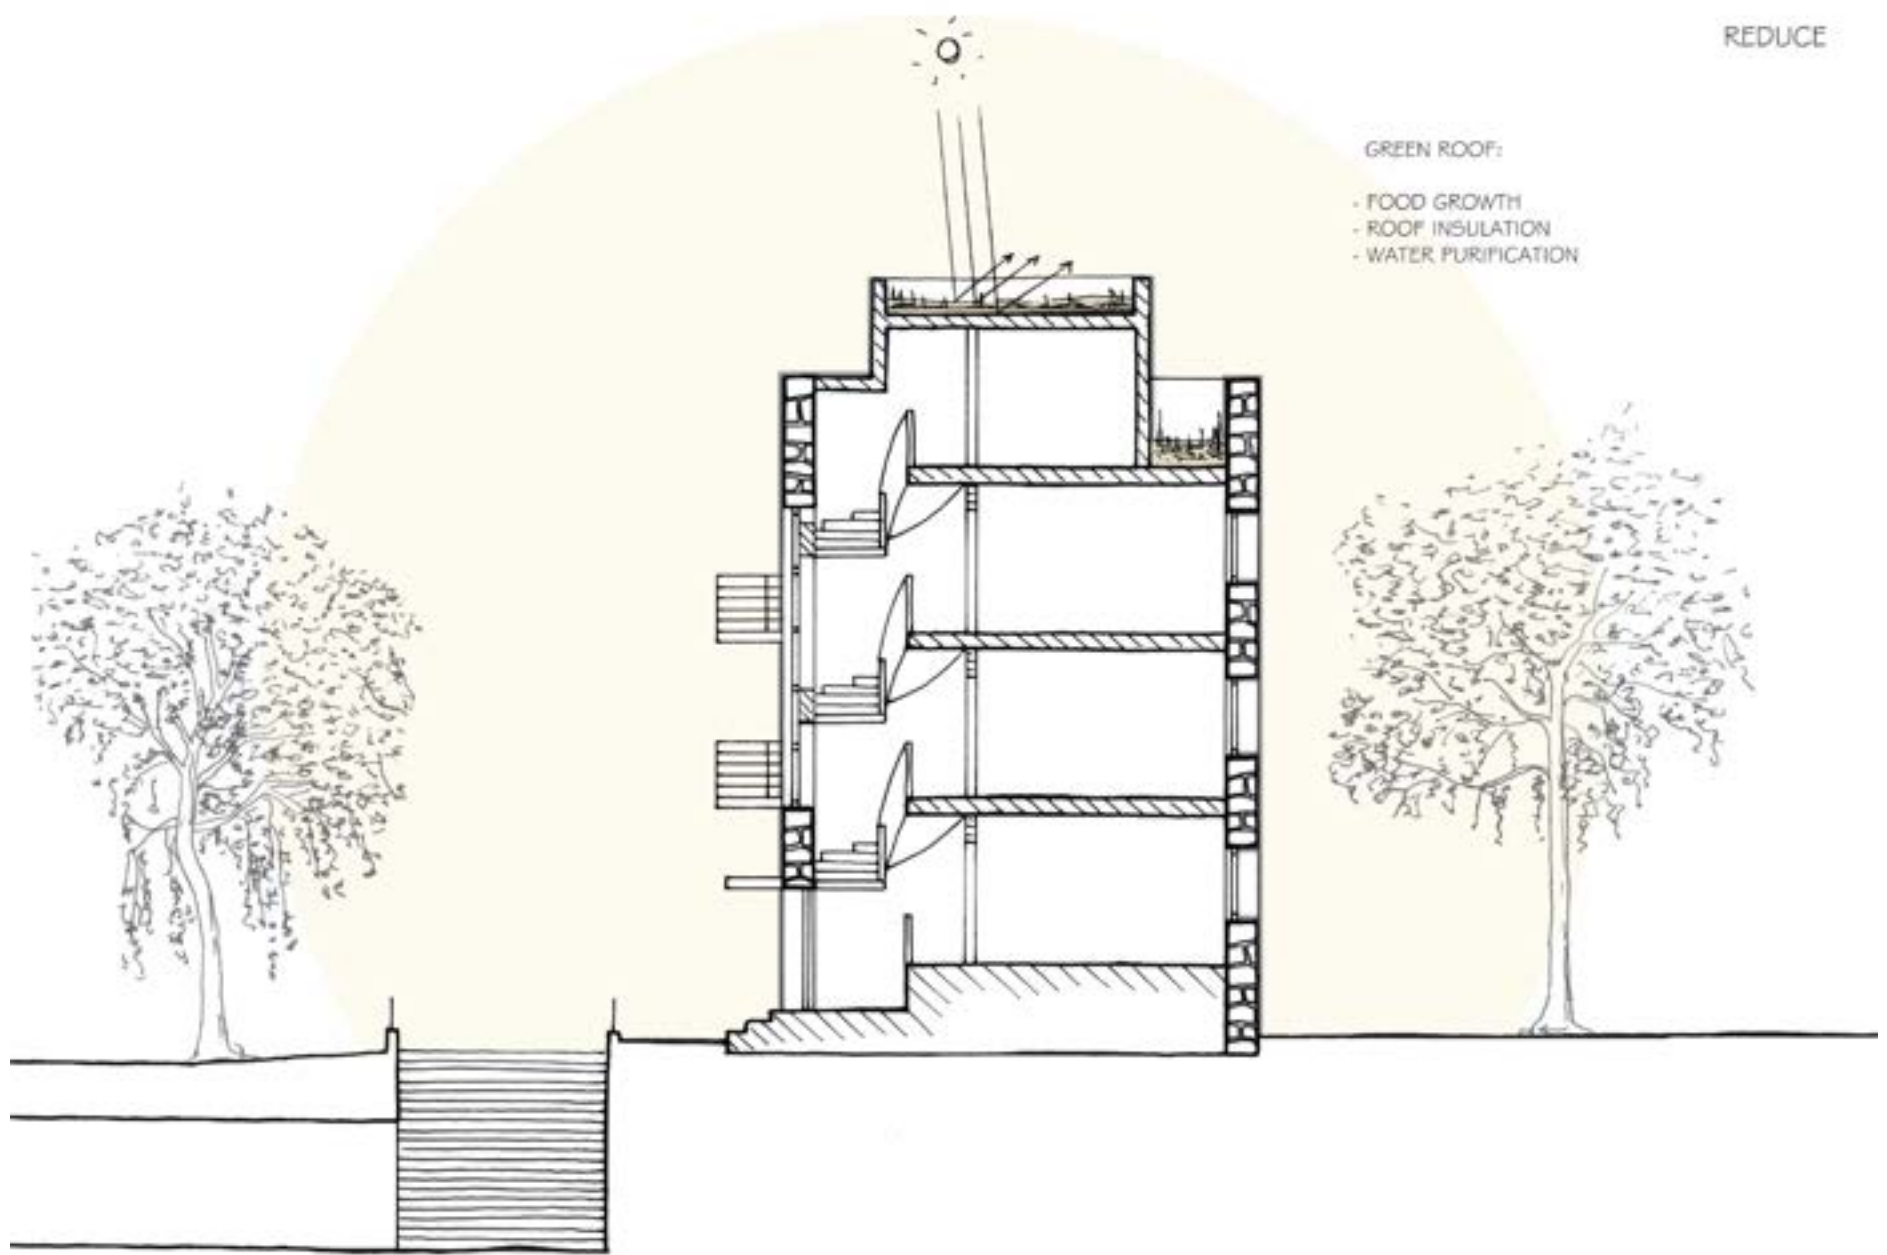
Author (2022). Section of the first building of Prosfygika - Reduce (green roof) [Sketch].
